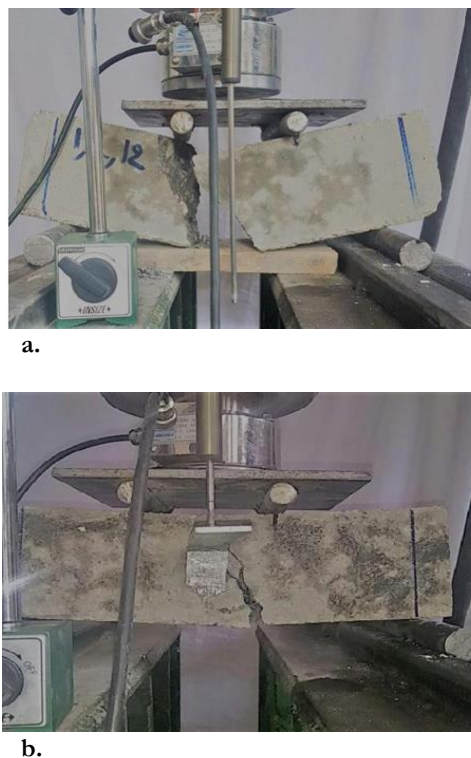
Failure modes of concrete specimens; a. containing steel fibers compared with, and b. specimens without steel fibers.
